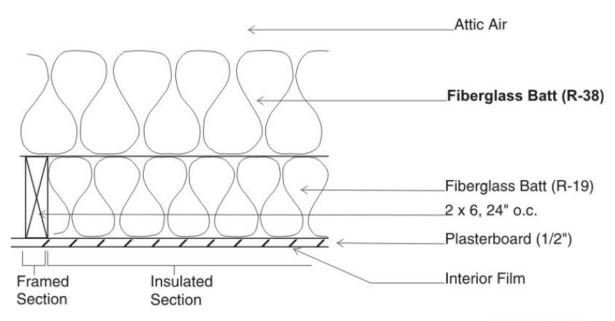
Case L120A Ceiling Construction (ANSI/ASHRAE 2011, Figure 7-10)
